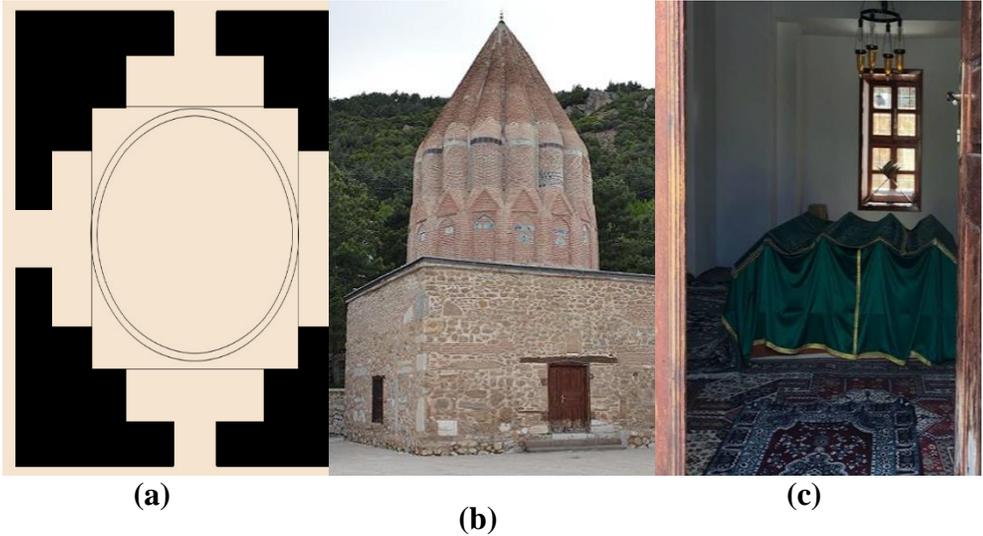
Buildings reflecting the urban characteristic of Akşehir (a-Seyyid Mahmut Hayrani's Tomb Plan b-Tomb's Facade c- Tomb's Interior (illustration: authors).
